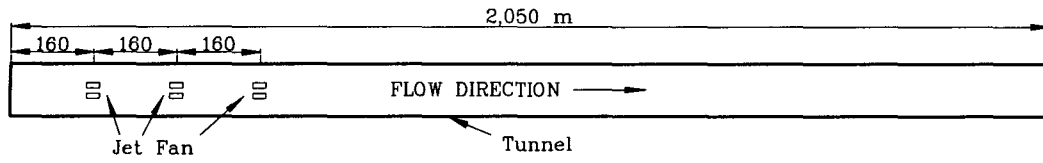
Planar view of tunnel and installed jet fans by pair.
